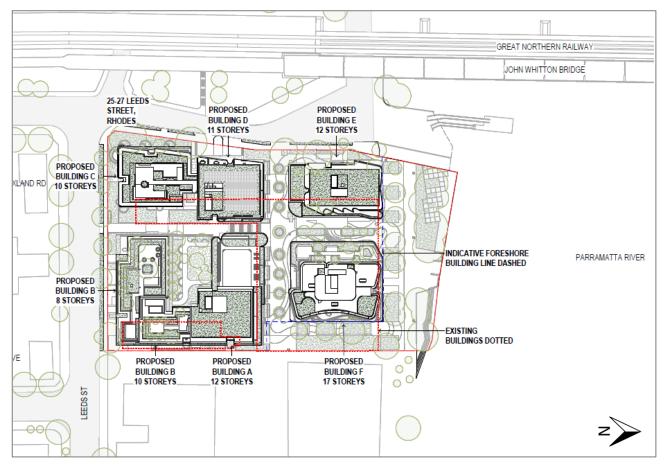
Site Plan (SJB Architects 6924-DA-0101/2)
